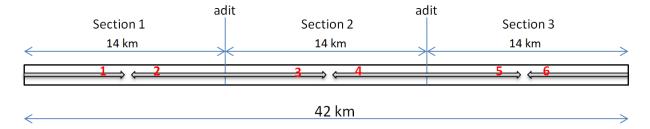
Schematic sketch of Hardangerjøkulen tunnel with 2 adits dividing the tunnel into 3 sections of equal length. This design will give 6 working faces.
